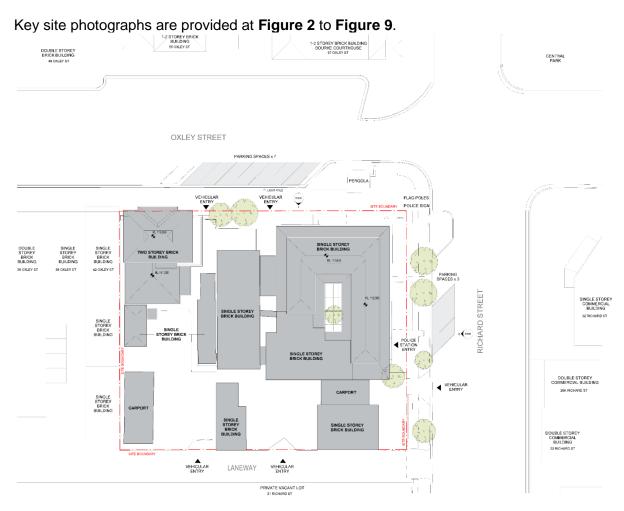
Existing Site Plan (Group GSA, Dwg No. BOU-AR-0100, Rev. A)
